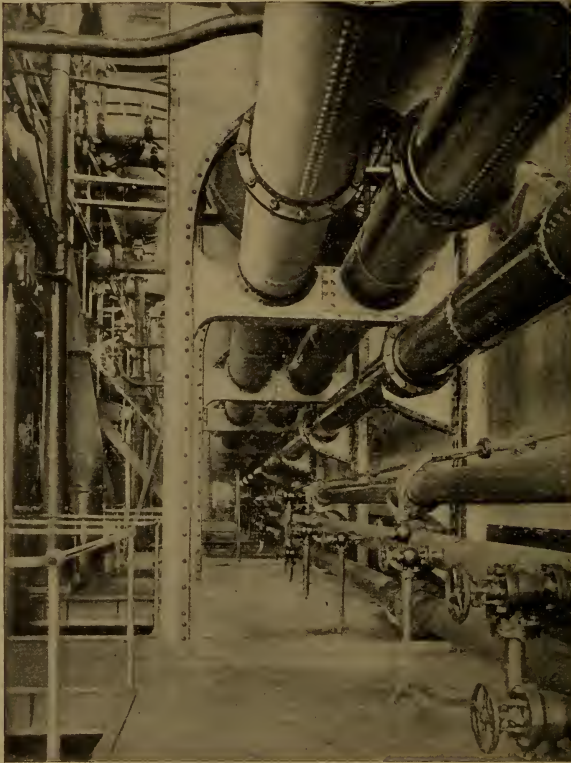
UNDERGROUND PIPES OF THE PARIS PLANT.
